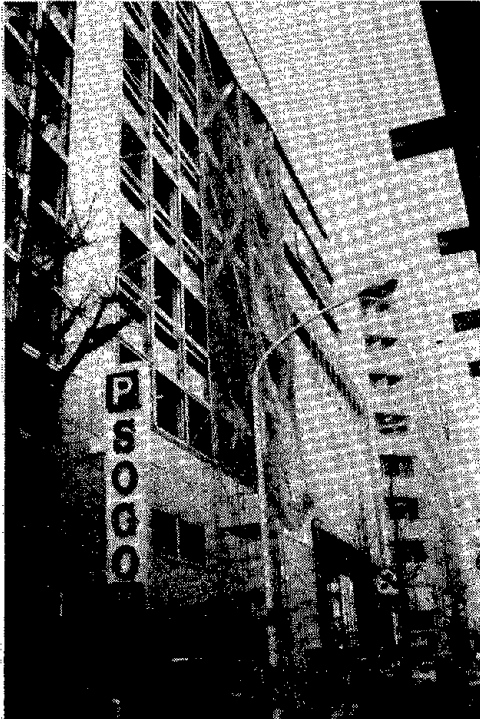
View of damaged, modern, cross-braced, steel building
